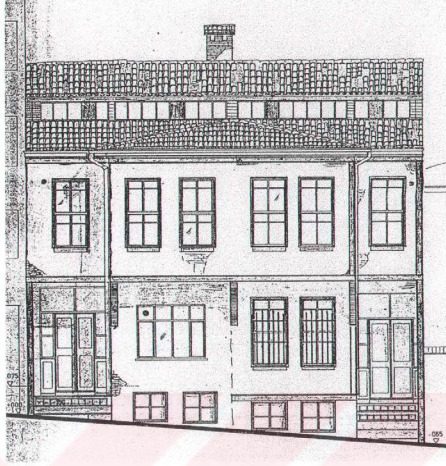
Sakaldöken Street, No: 4-6, Street Façade
